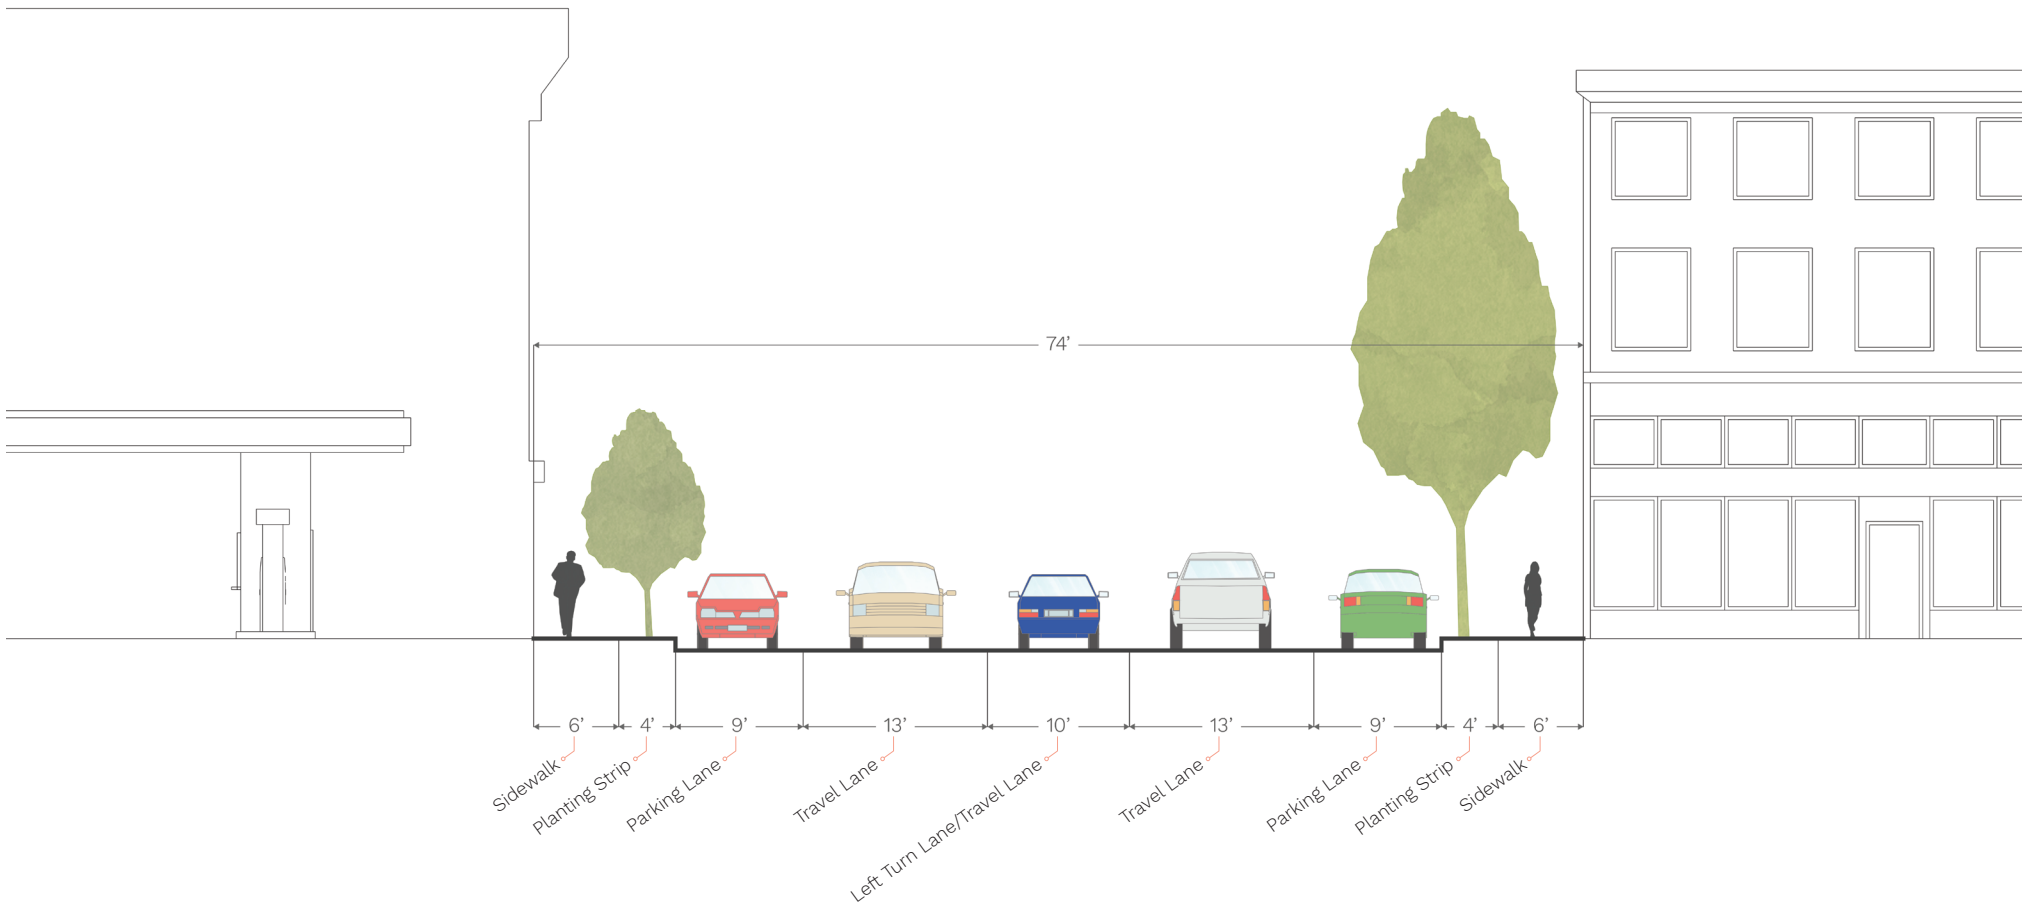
E Pike Street Existing Conditions Section (Facing East)
